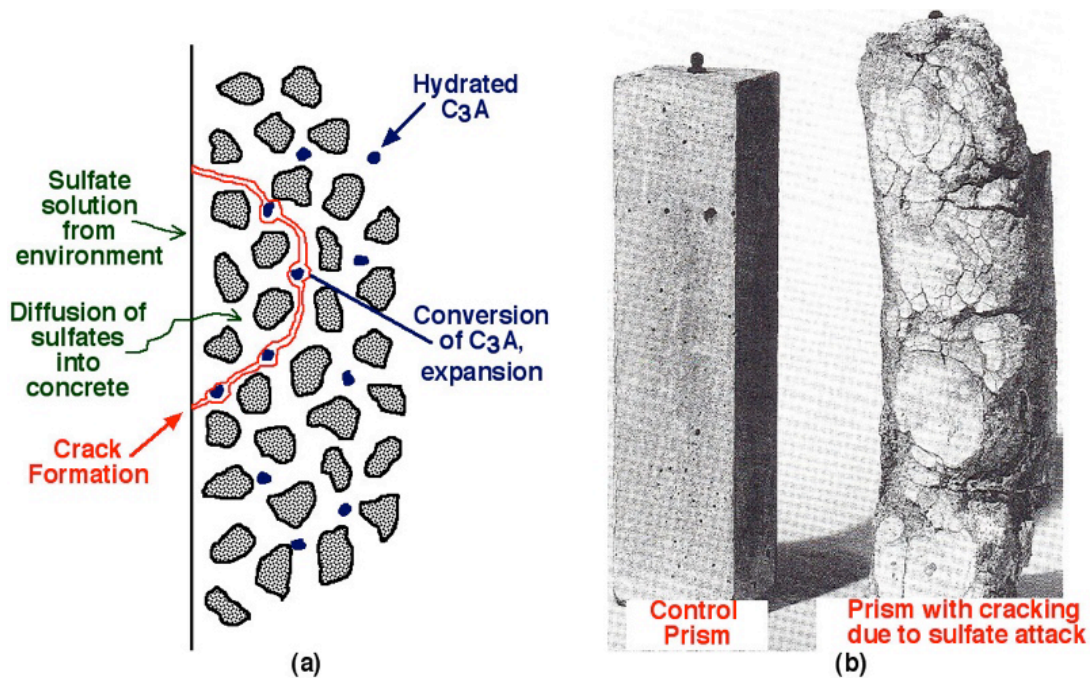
Concrete cracking due to sulfate attack: (a) mechanism, (b) example of concrete cracking due to sulfate attack [41].
